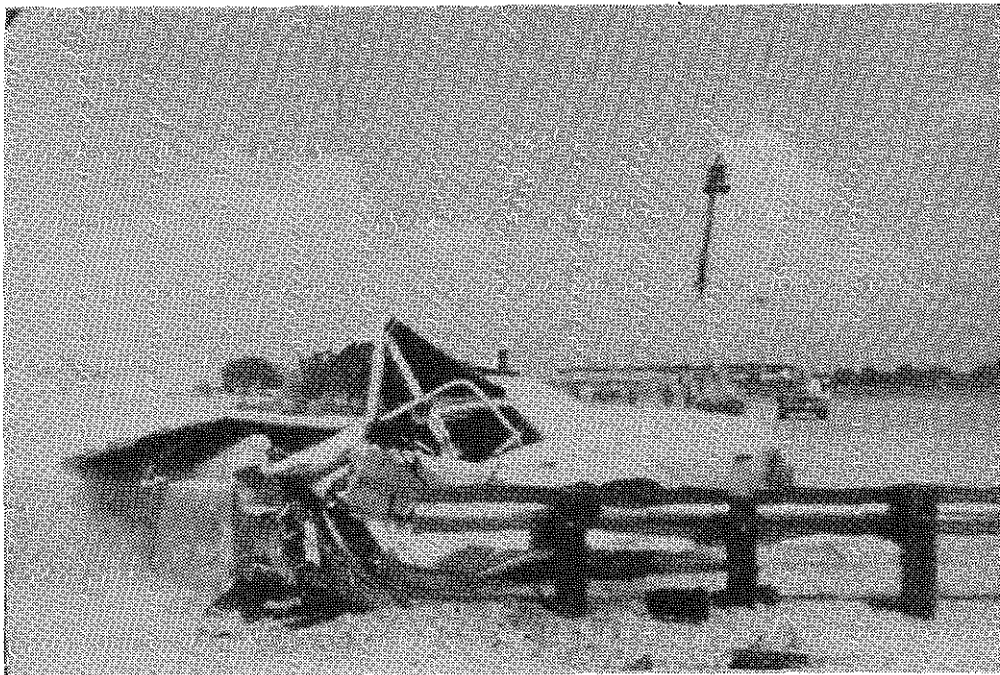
VEHICLE AND BARRIER DAMAGE AFTER TEST LA-1
